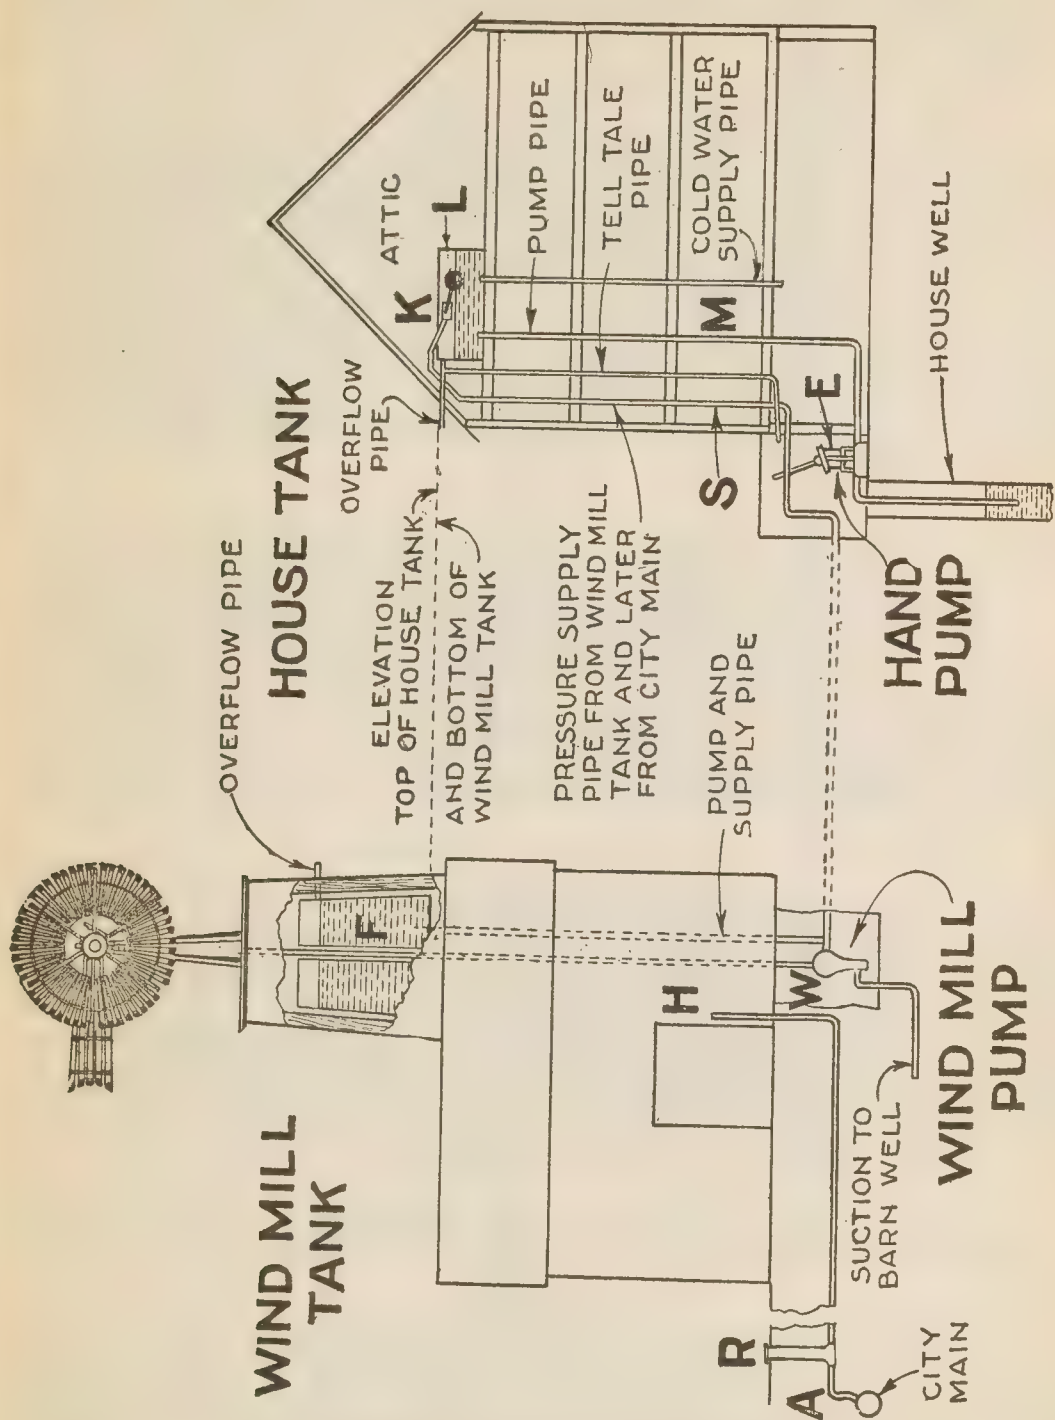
,556—Cold water supply as installed in the author's residence "Stornoway" near Sea Bright, N. J., illustrating how the tank system is adapted to changing conditions. L, house tank; F, wind mill tank; M, hand pump pipe; S, wind mill pump pipe; E, hand pump; W, wind mill pump; H, city connection; R, street shut off; A city main.
